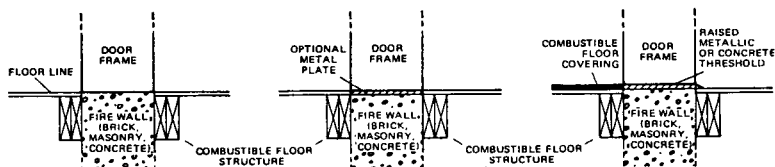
Noncombustible sill used with combustible floors for doors swinging into steel frame.
